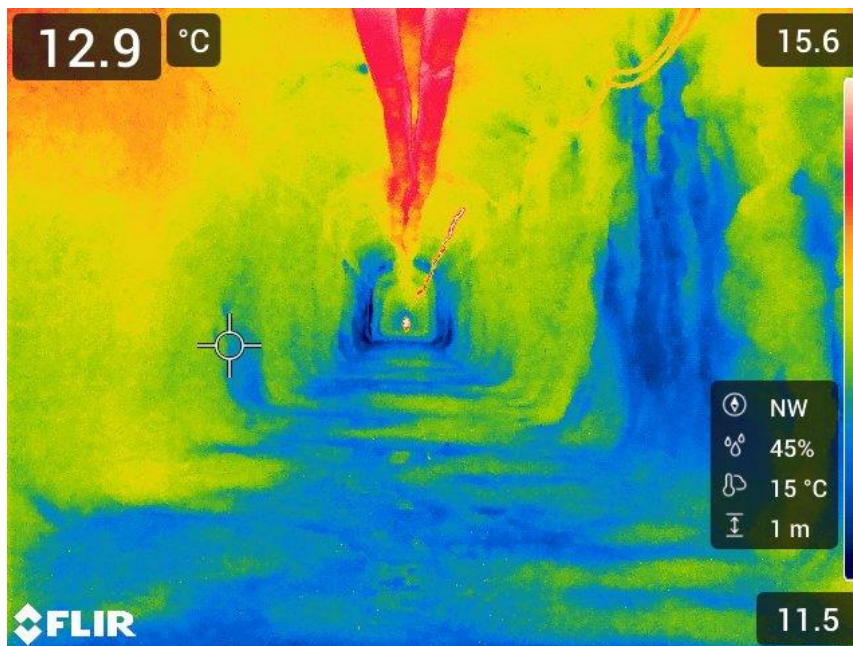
IR-image at the start of the deposition tunnel 5-1 (DT5-1). Floor and walls are exposed rock, roof is covered with steel mesh reinforcement 16.12.2022.
